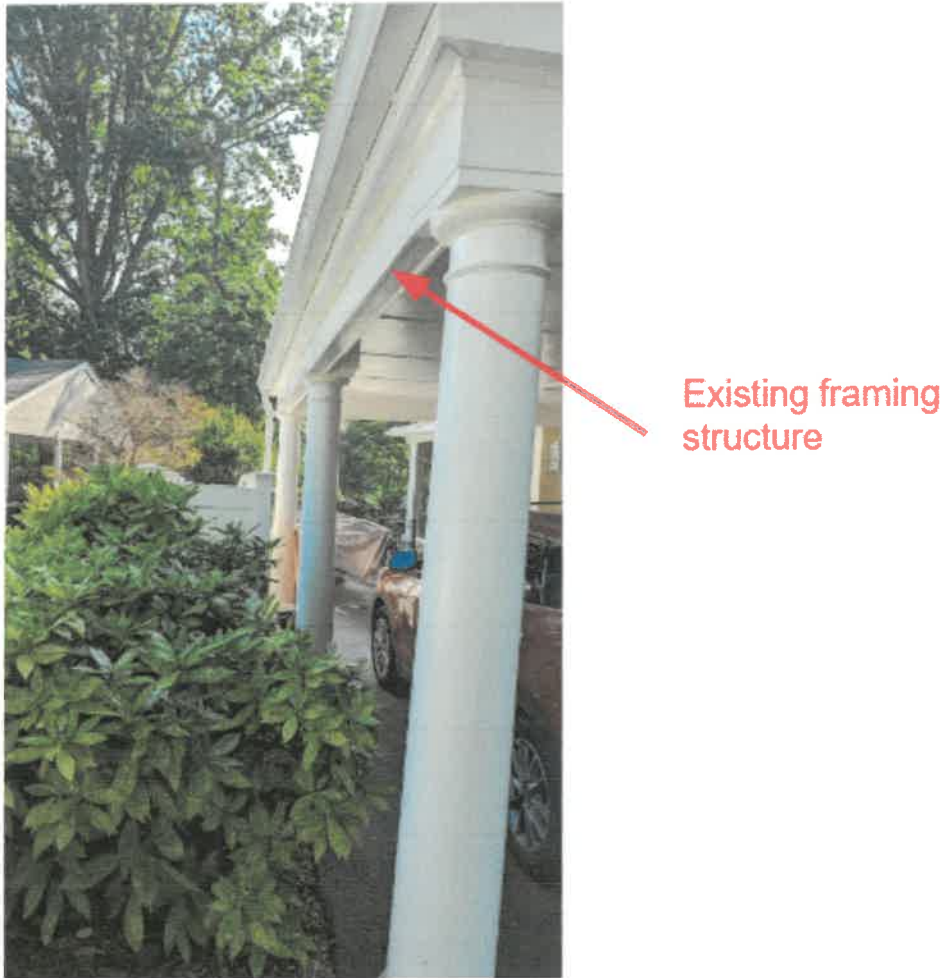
Existing framing is located on the exterior portion of columns. Walls will be constructed to this framing structure.
